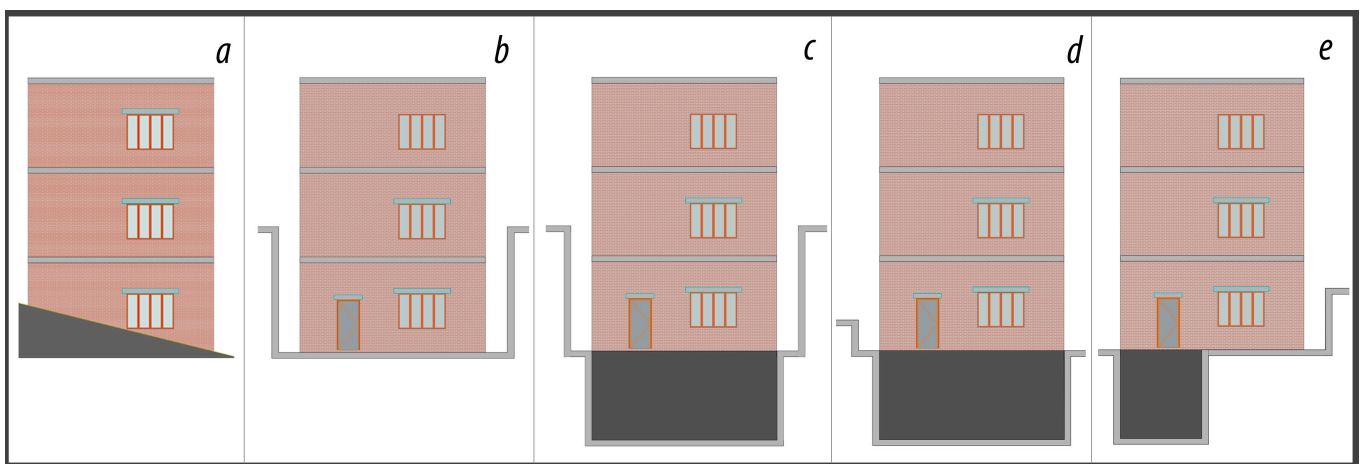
Specification of the number of stories (for the 3-stories buildings): (a) Hill slope effect, (b) Below ground level, (c) Below ground level and has a basement, (d) Having a basement in the building, (e) Having partial basement in the building.
